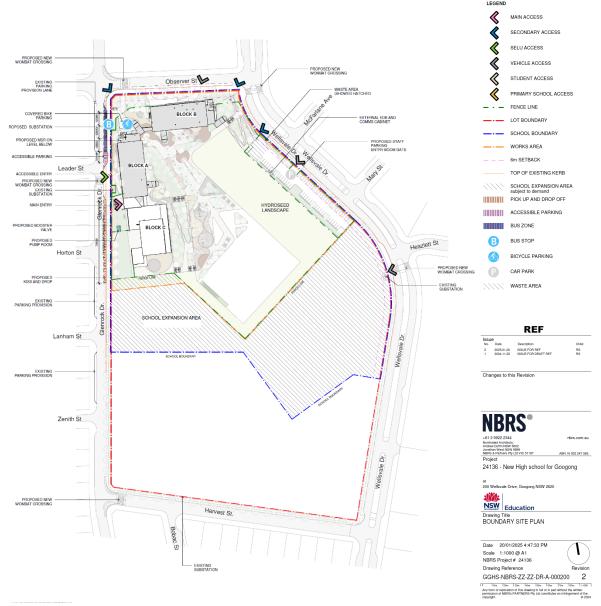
New high school for Googong - indicative Site Plan, subject to detailed design (Source: NBRS, 20/01/2025).
